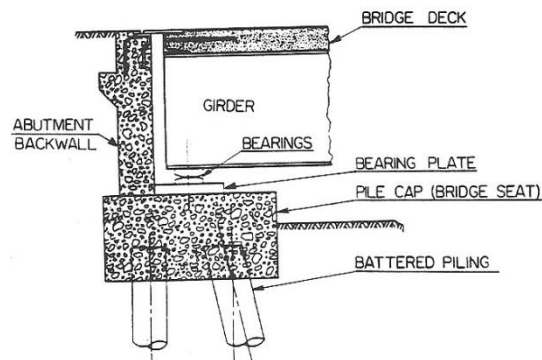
Abutment Detail of Bridge with Expansion Joints
